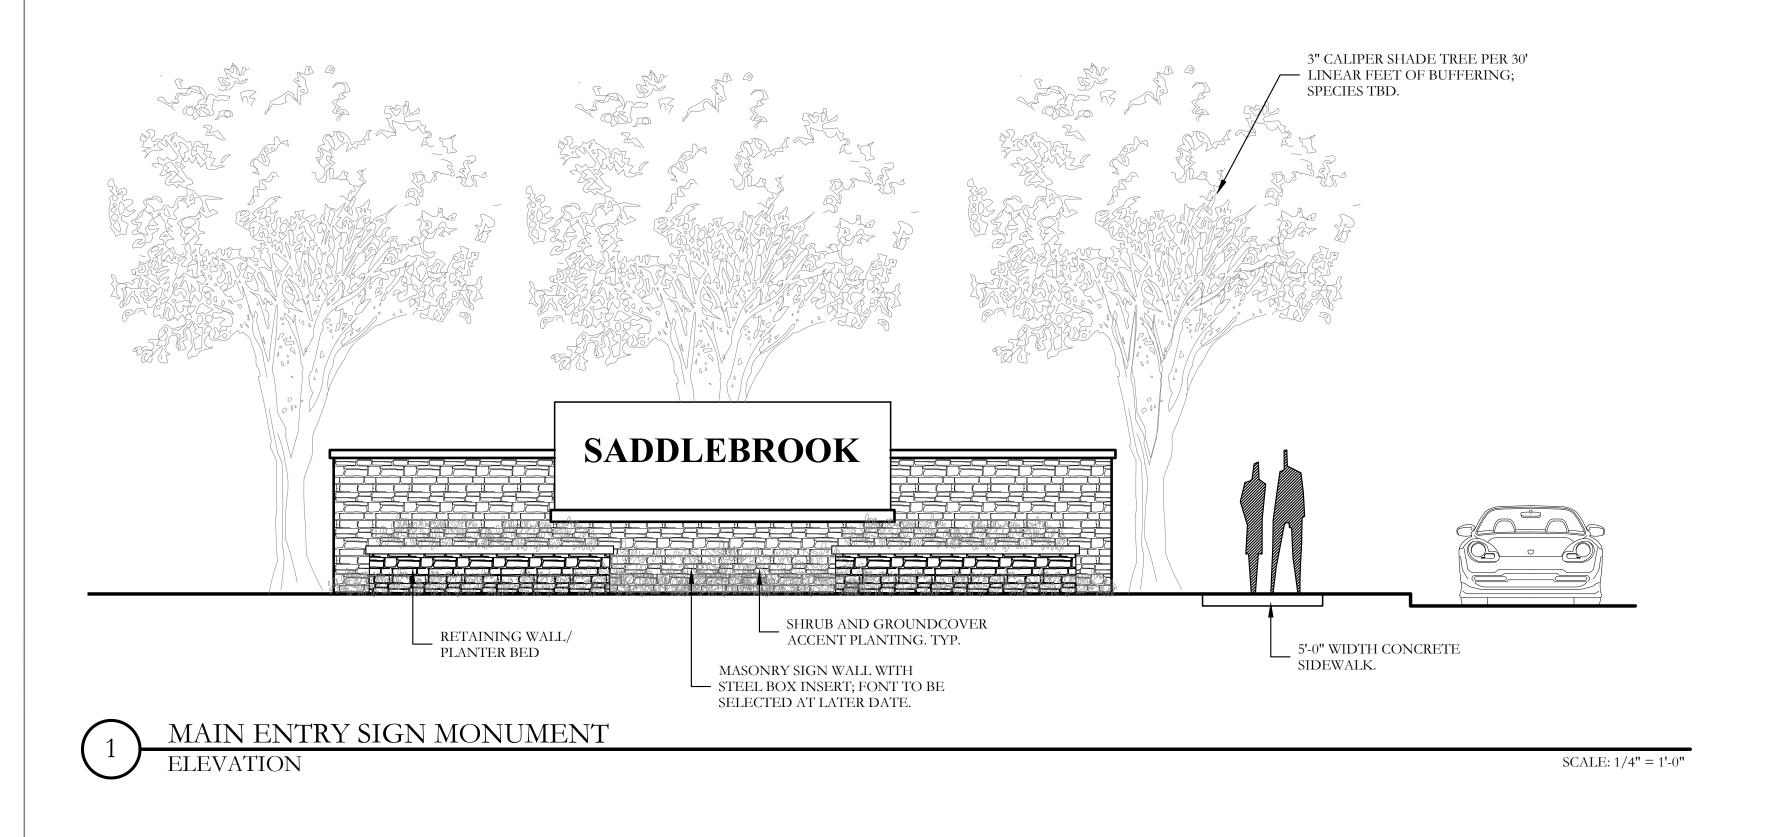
EXHIBIT F CONCEPTUAL LANDSCAPE PLAN
